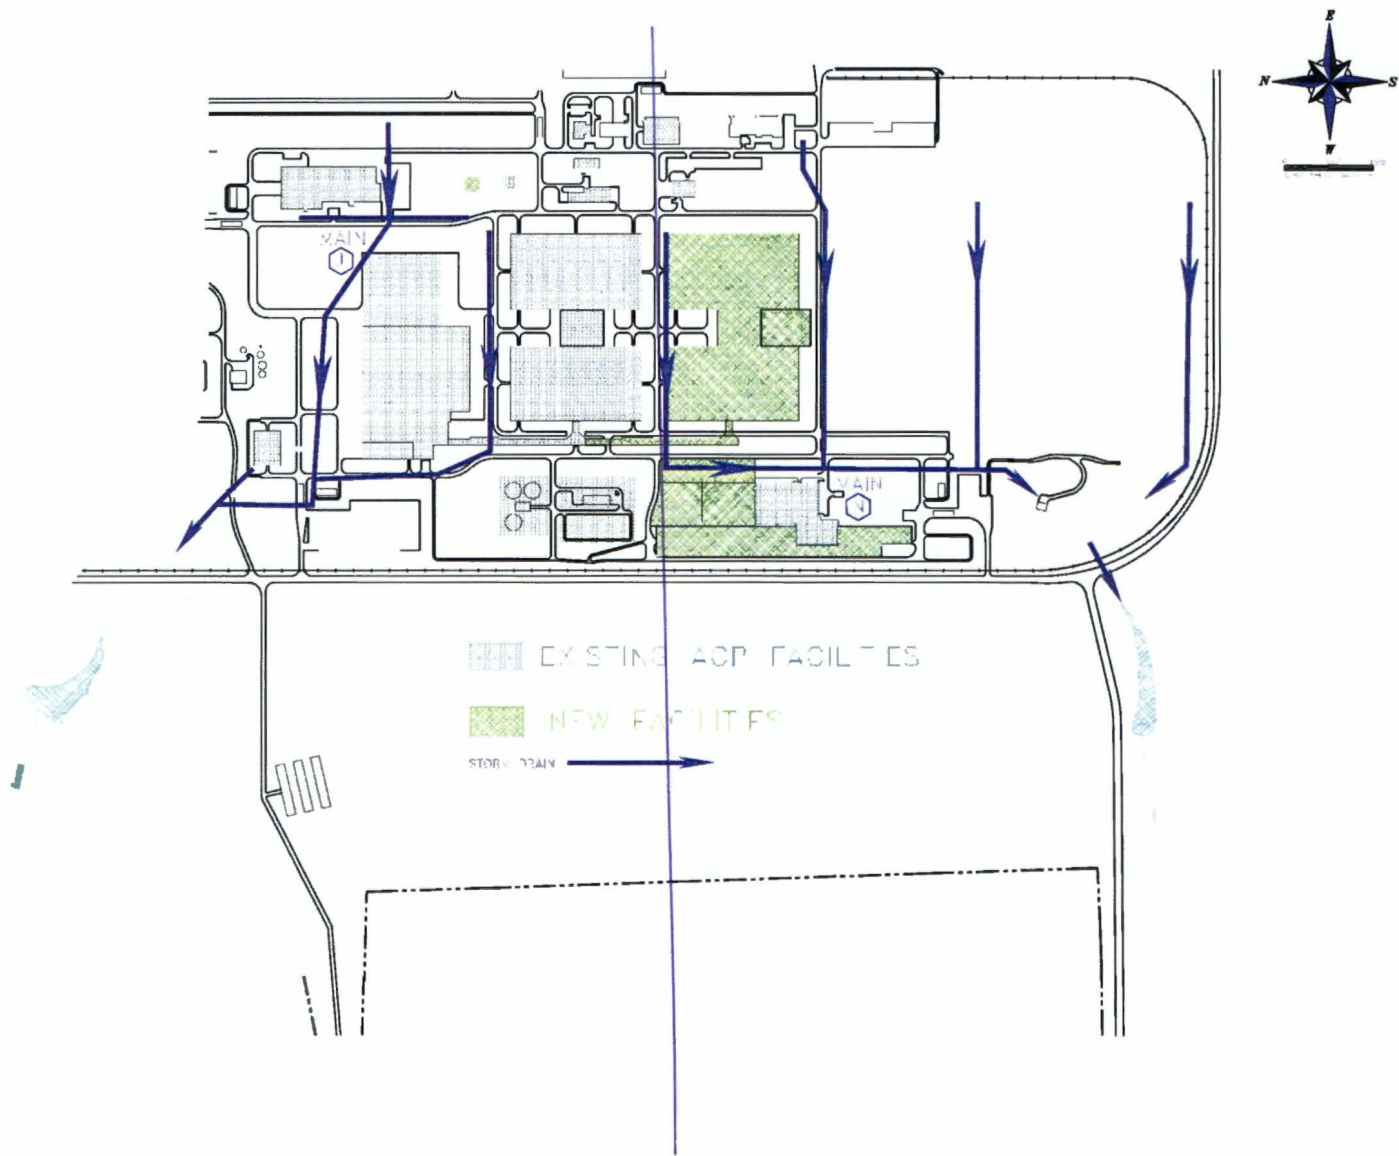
U.S. Department of Energy Reservation Storm Sewer Location
